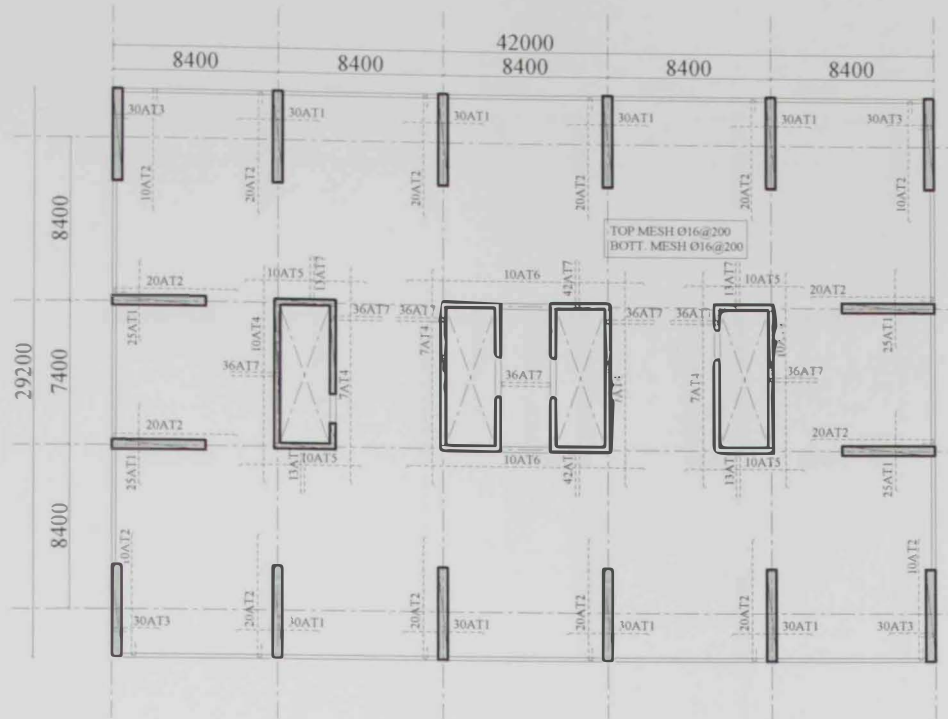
Slab reinforcement details of B1-REG and B2-SST at all levels, and B3-GEO, B4-DIS and B5-WST at typical story levels
